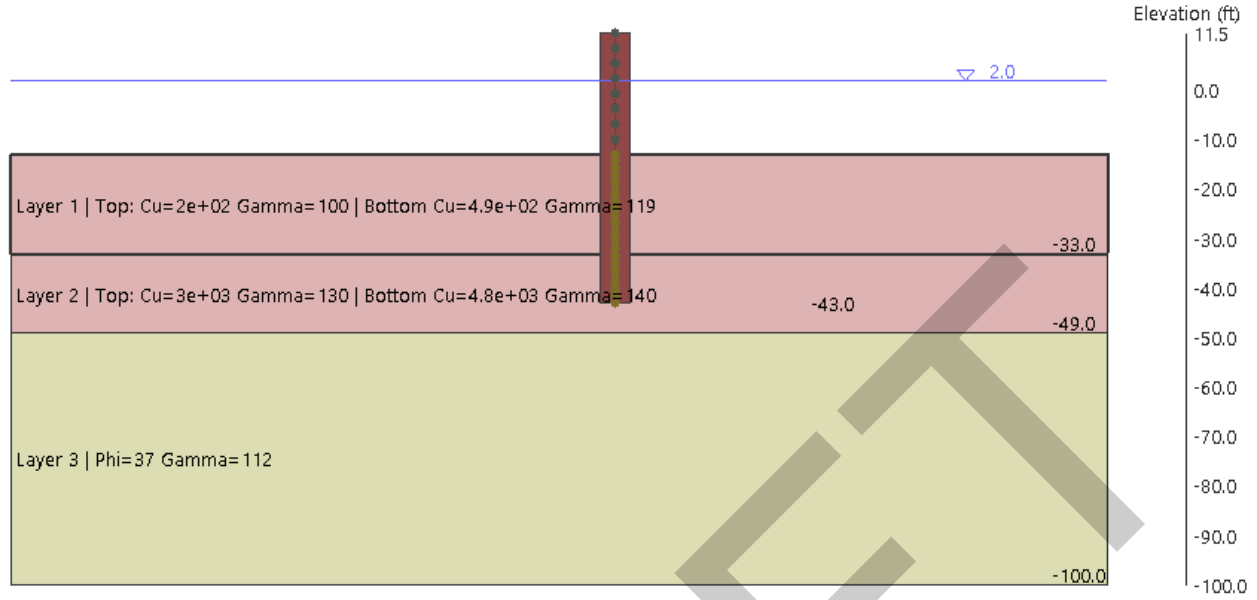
18" SuperPILE Soil Cross Section – C4 Soil
